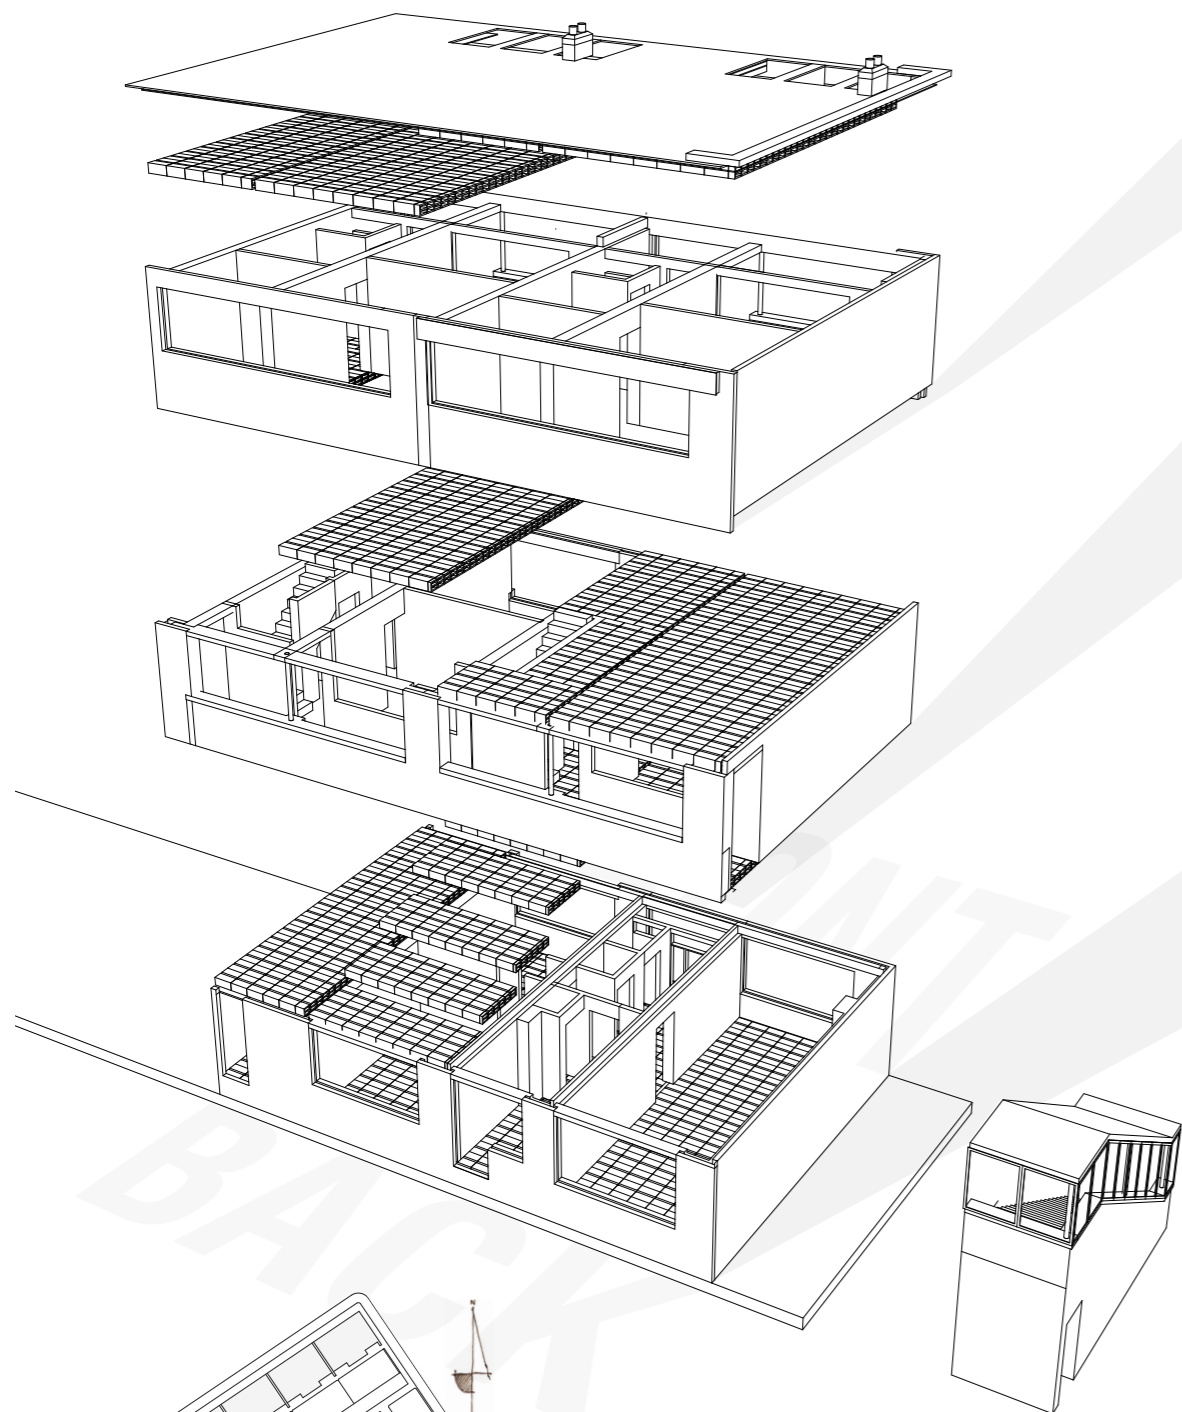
Fig.S (above) /// Exploded construction of existing building showing two two-storey maisonettes above a single ground floor flat. Access to maisonettes is from a covered, elevated walkway above the ground floor flat, reachable by side stairs.
